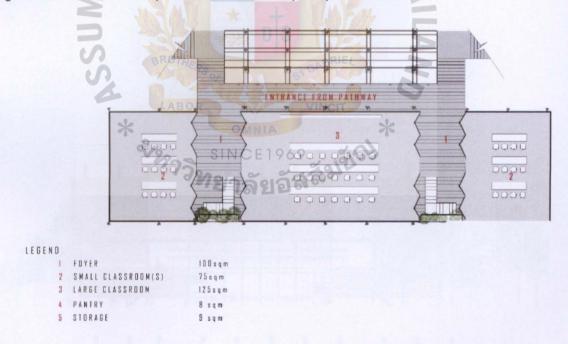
Educational centre (Vocational workshop) floor plan – Second floor
